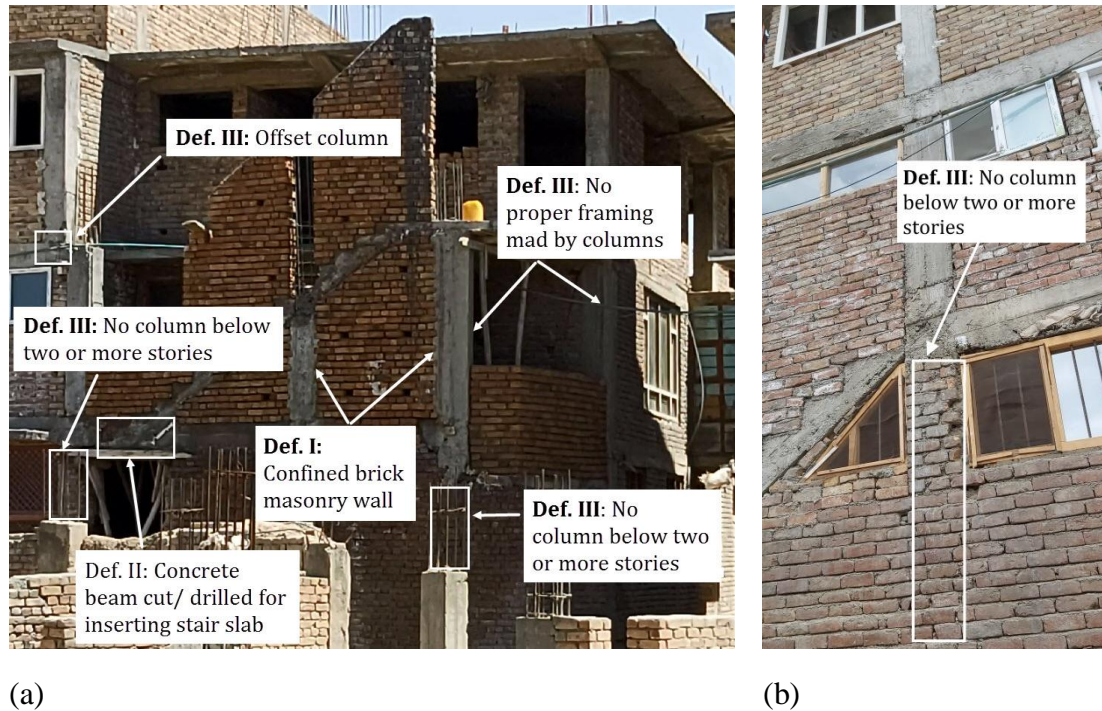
(a) Multiple construction deficiencies in a four (or more) story reinforced concrete building (Photo by the author, 2019). (b) Deficiency type III, column at a lower story is removed (Photo by the author, 2019)
